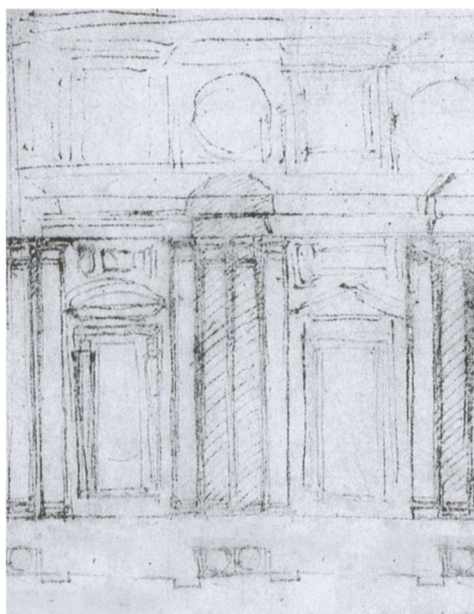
Michelangelo, detail of Casa Buonarroti 48A recto, elevation, with the plan detail (located above the elevation in the original drawing) shifted to below the paired columns and flanking pilasters of the elevation (Photoshop manipulations: author)
